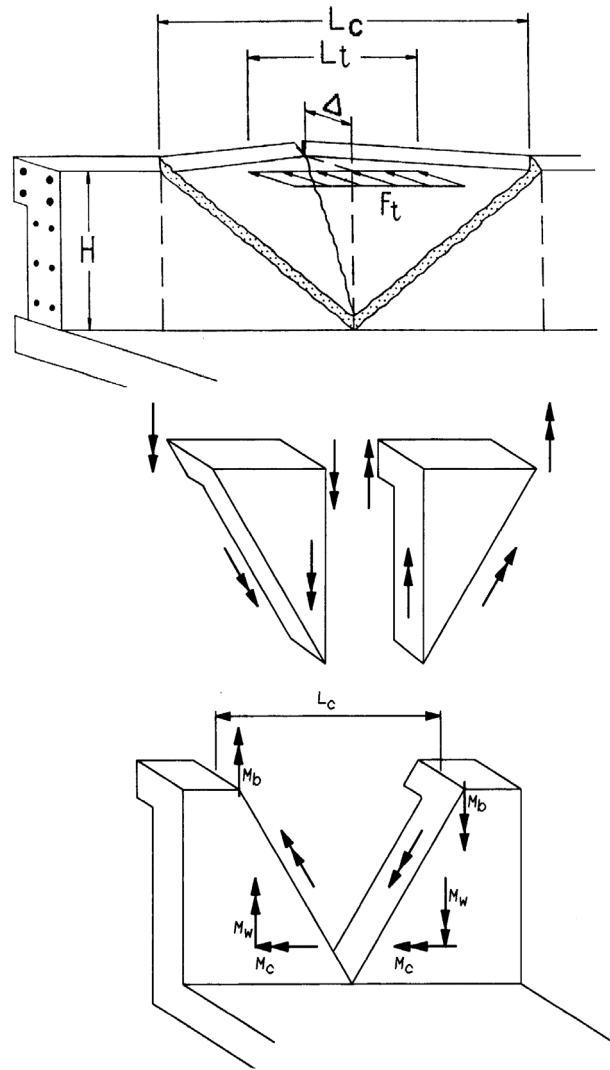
Yield Line Analysis of Concrete Parapet Walls for Impact within Wall Segment
